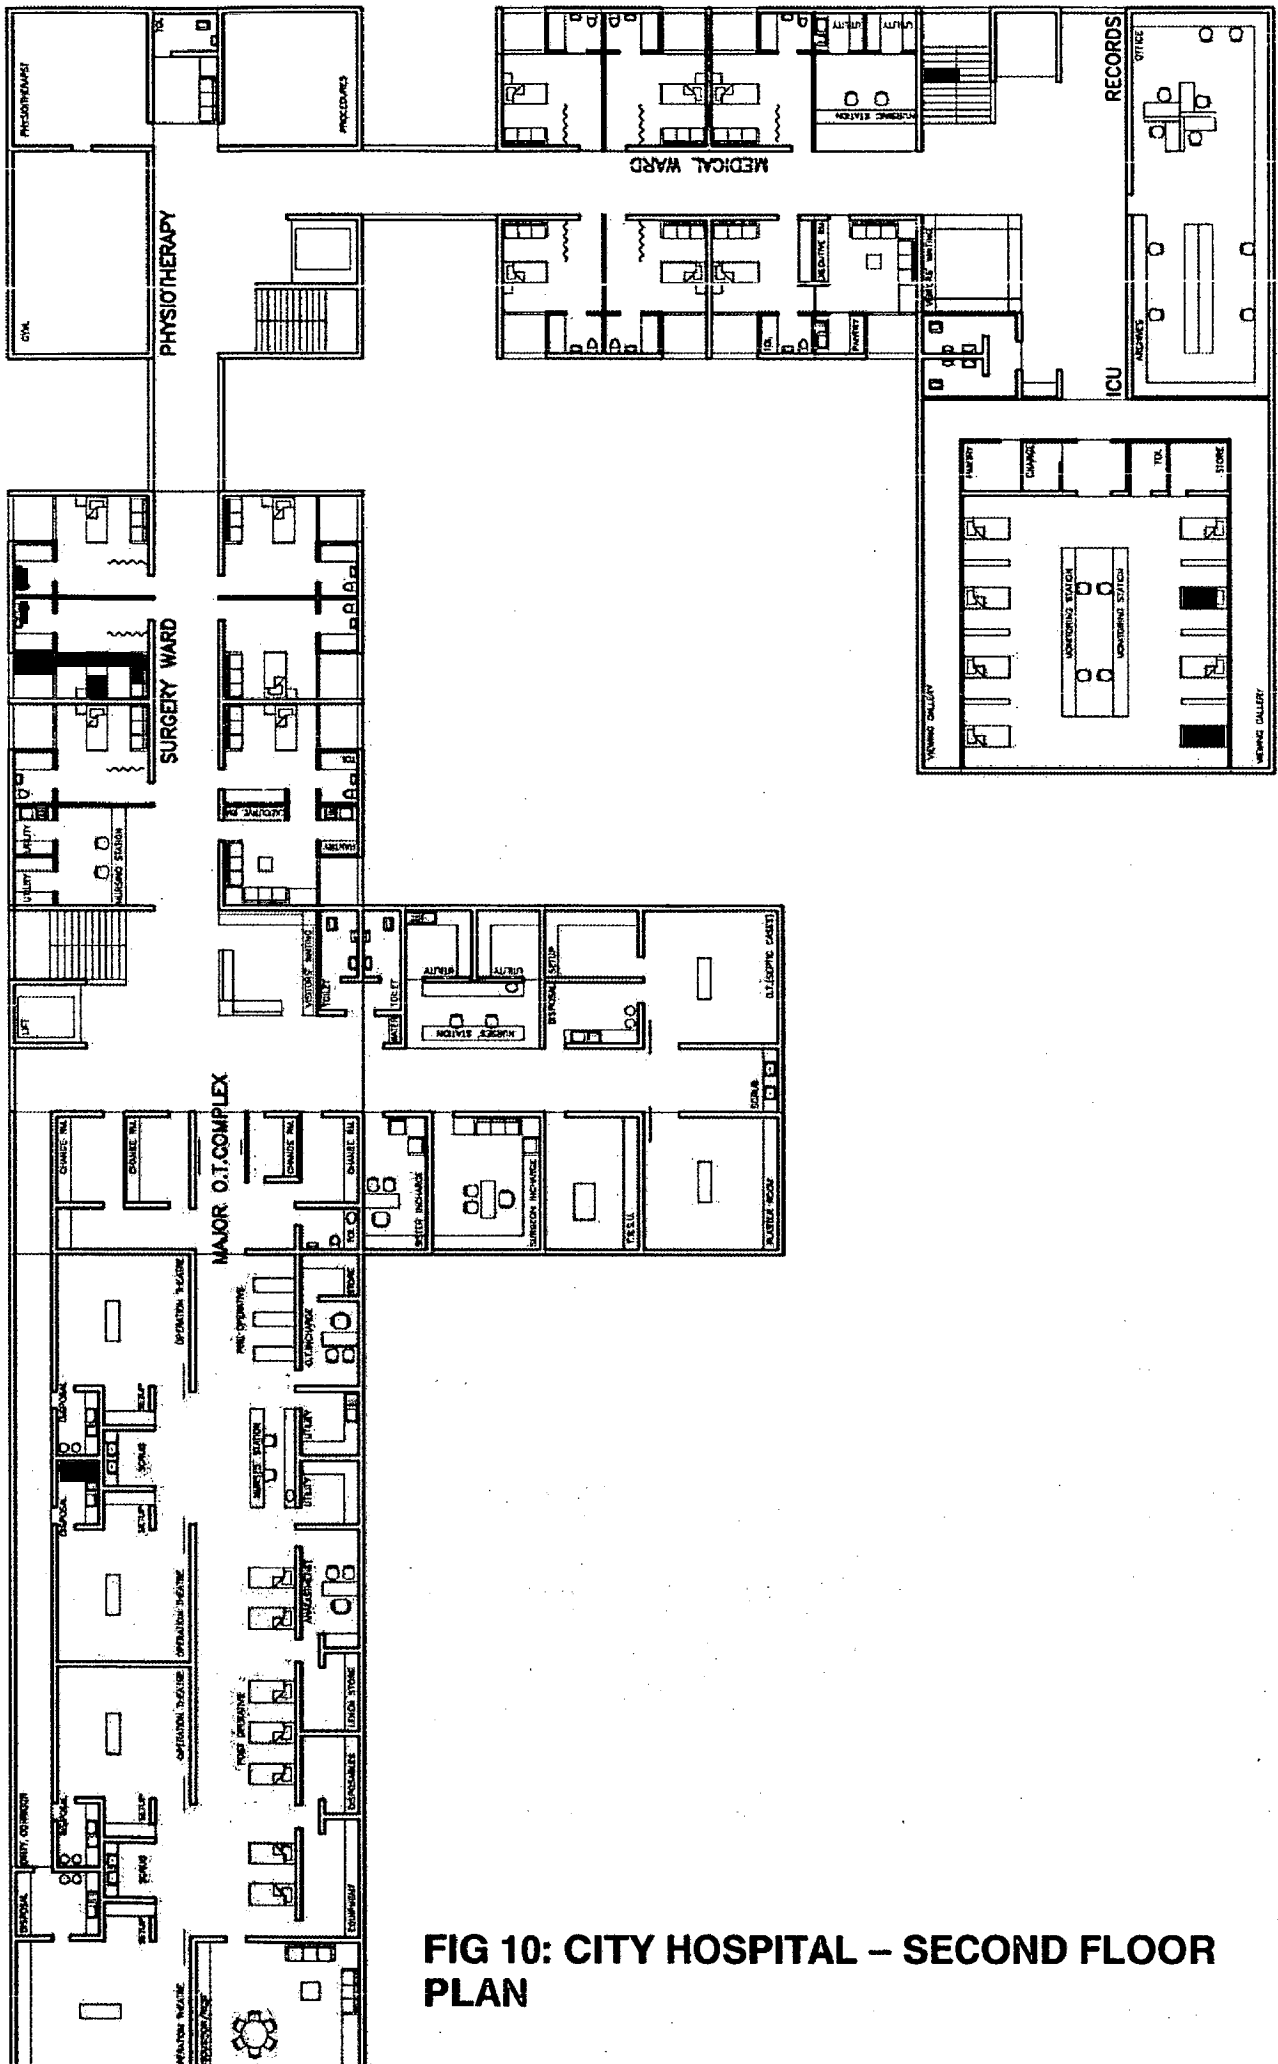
CITY HOSPITAL – SECOND FLOOR PLAN
